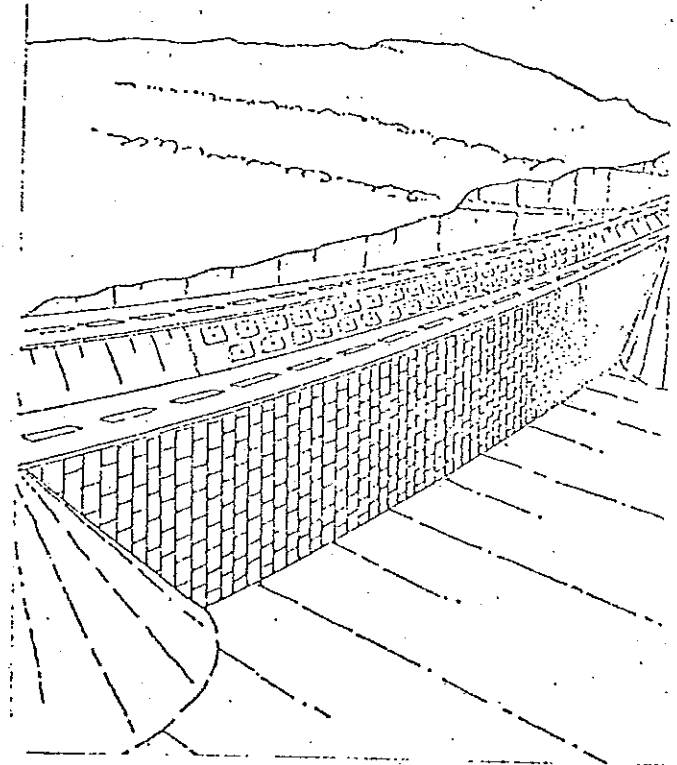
FINISHED WALL SHOWING ANCHORS
